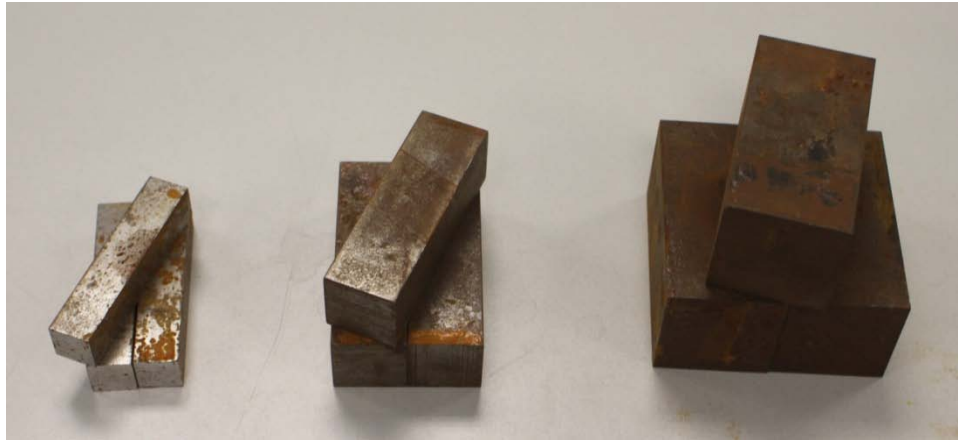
Metal Bricks Used to Load the Laminated Glass Beams
